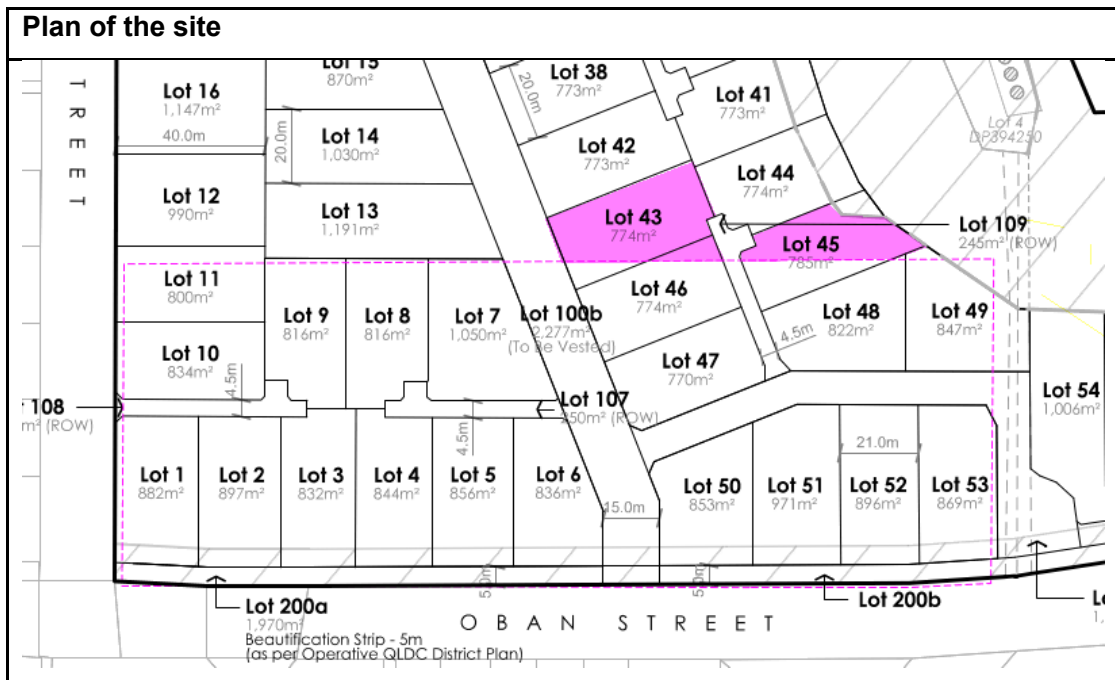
Plan showing area of re-zoning request from submission (Relief 3339.17)
